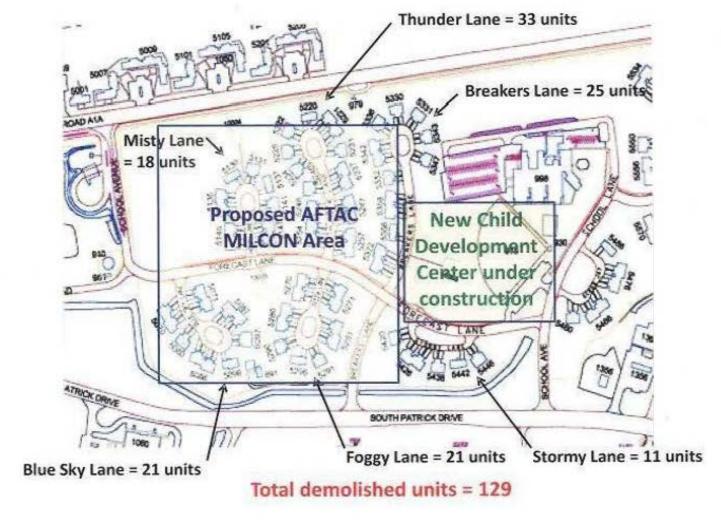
PROPOSED PROJECT SITE PLAN IN CENTRAL HOUSING
